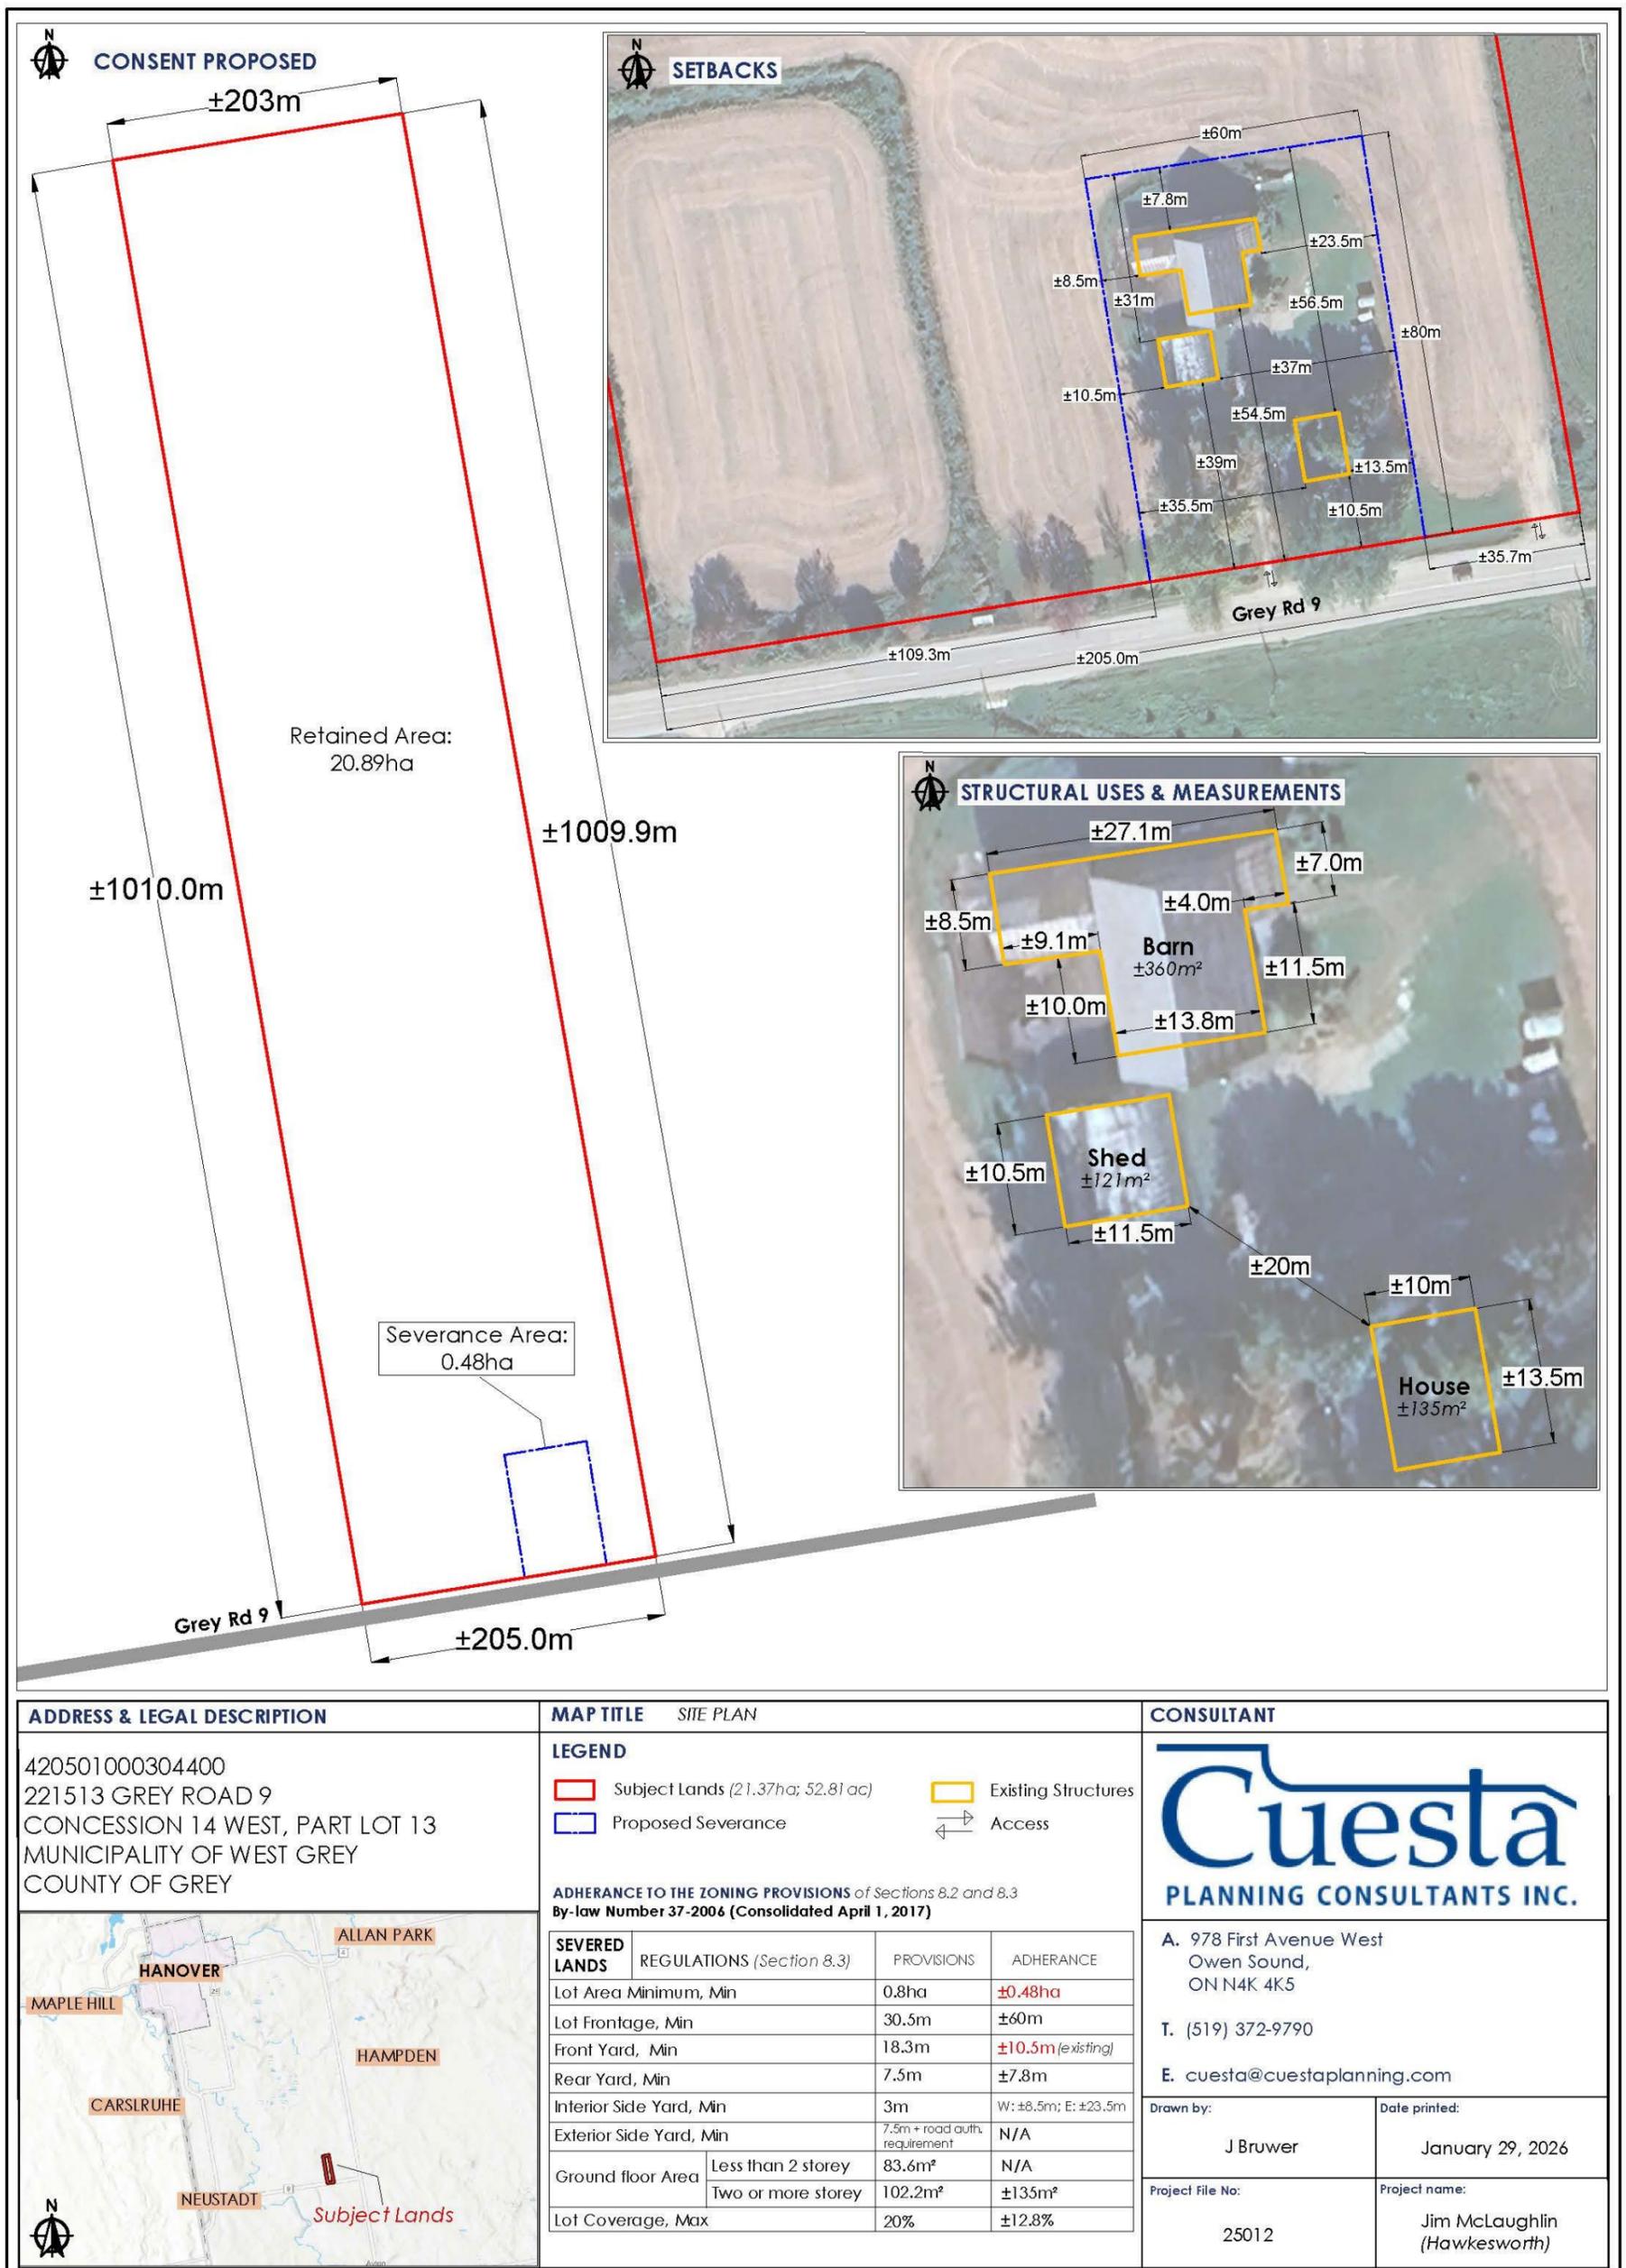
Site Plan (full size site plan provided as a separate appendix)
